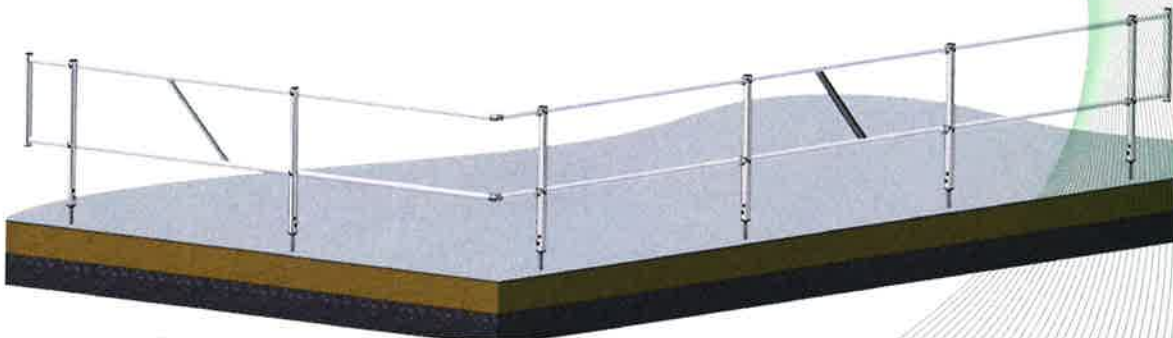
LUX-top® G-T DIREKT WD, to bypass heat-insulated surfaces (assembly example)
